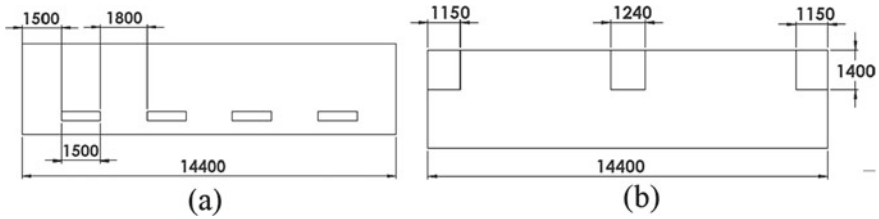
Dimensions of the a Inlet b Outlet (all dimensions are in millimeters) [3]
